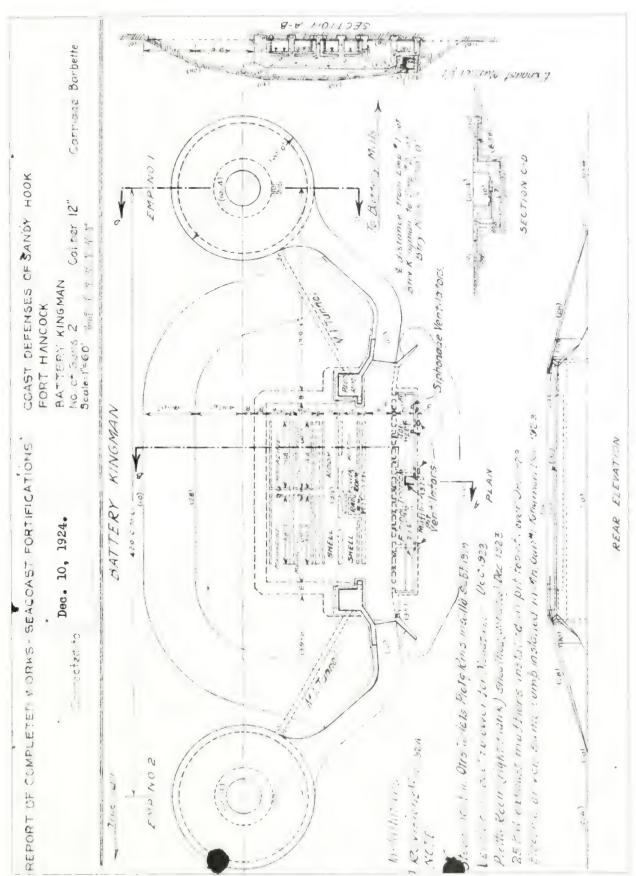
Plan, elevation, and sections of Battery Kingman, 1924. The battery's design featured two open emplacements separated by an engineered earthwork. The earthwork covered a concrete structure for storage and personnel and also served to protect the neighboring platform from a misfire (Report of Completed Works, CDSG ePress).
